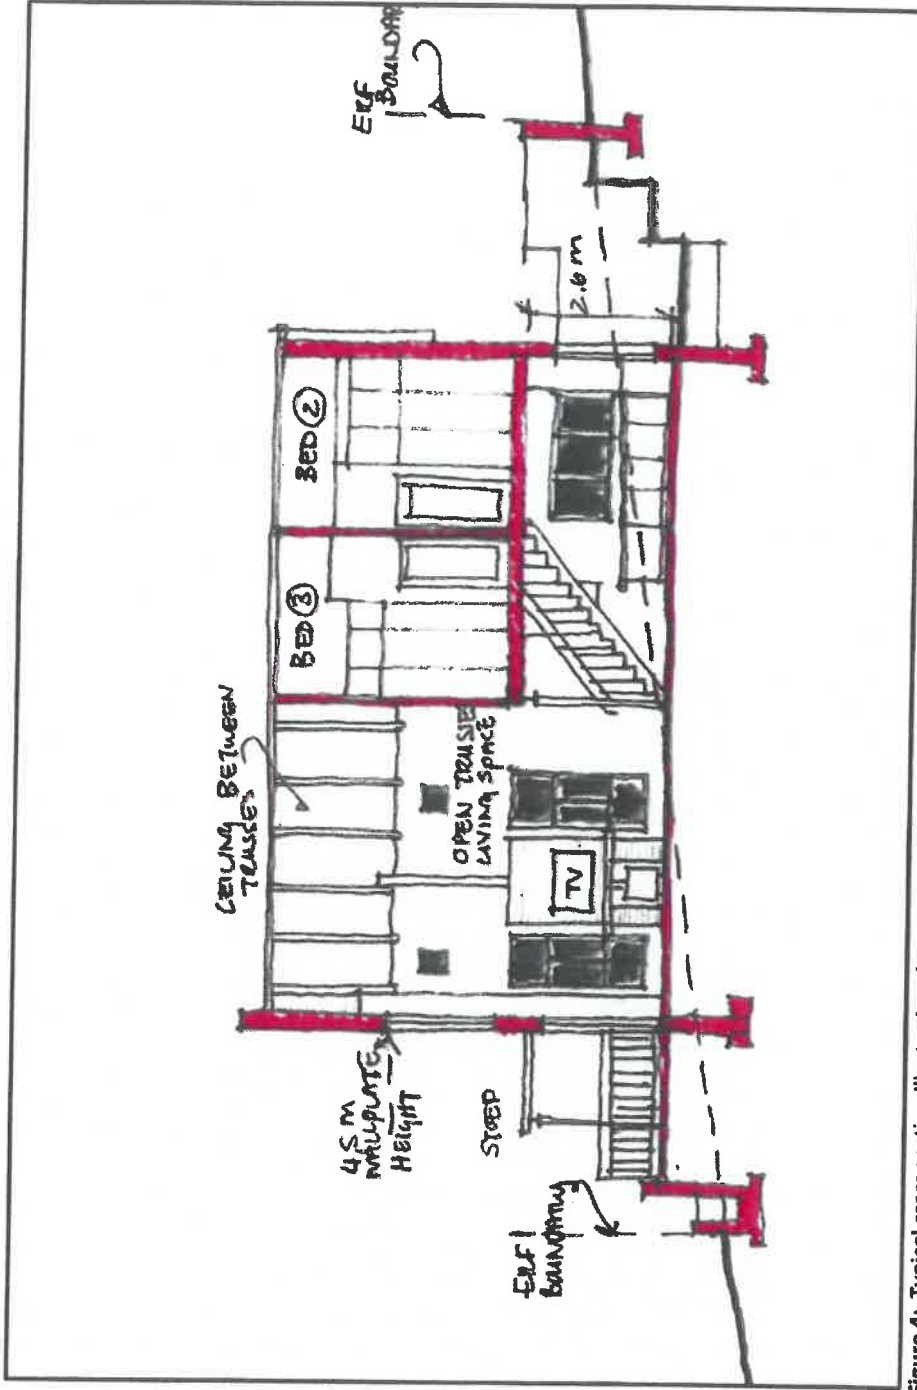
Typical cross section illustrating slope and impact on houses and retaining structures and the ground plan of erven
